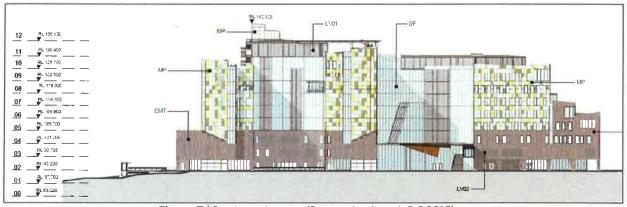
| Southern elevation (Source: Applicant's RtS 2018)
